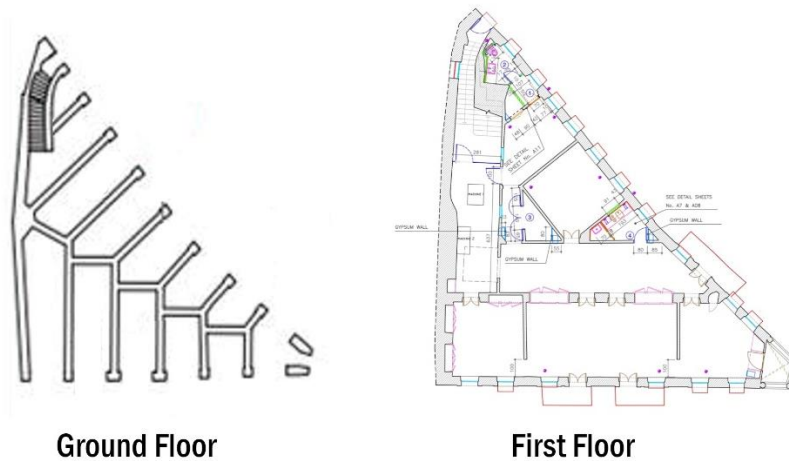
Ground and First floor As it was before the restoration (Hebron Reconstruction Committee,2021)
